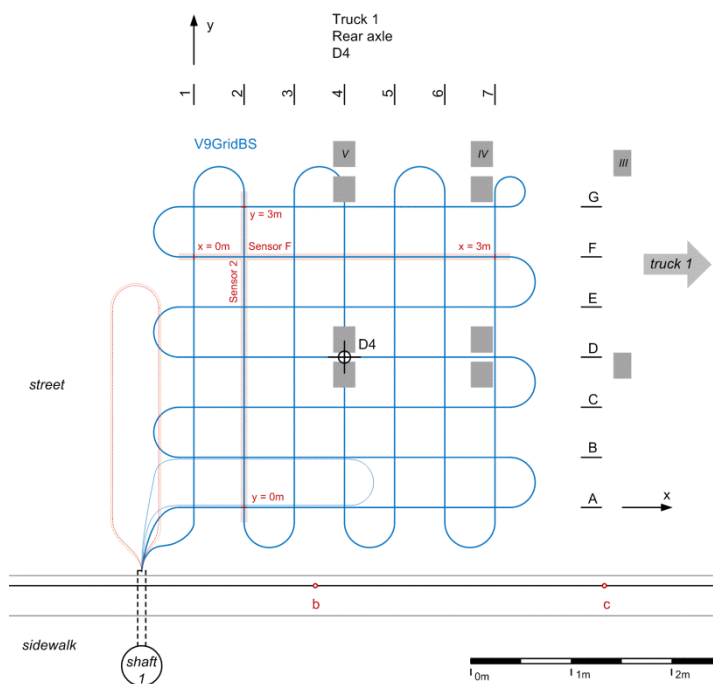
Footprint of truck 1 in tests using the rear axle with sensor V9GridBS
